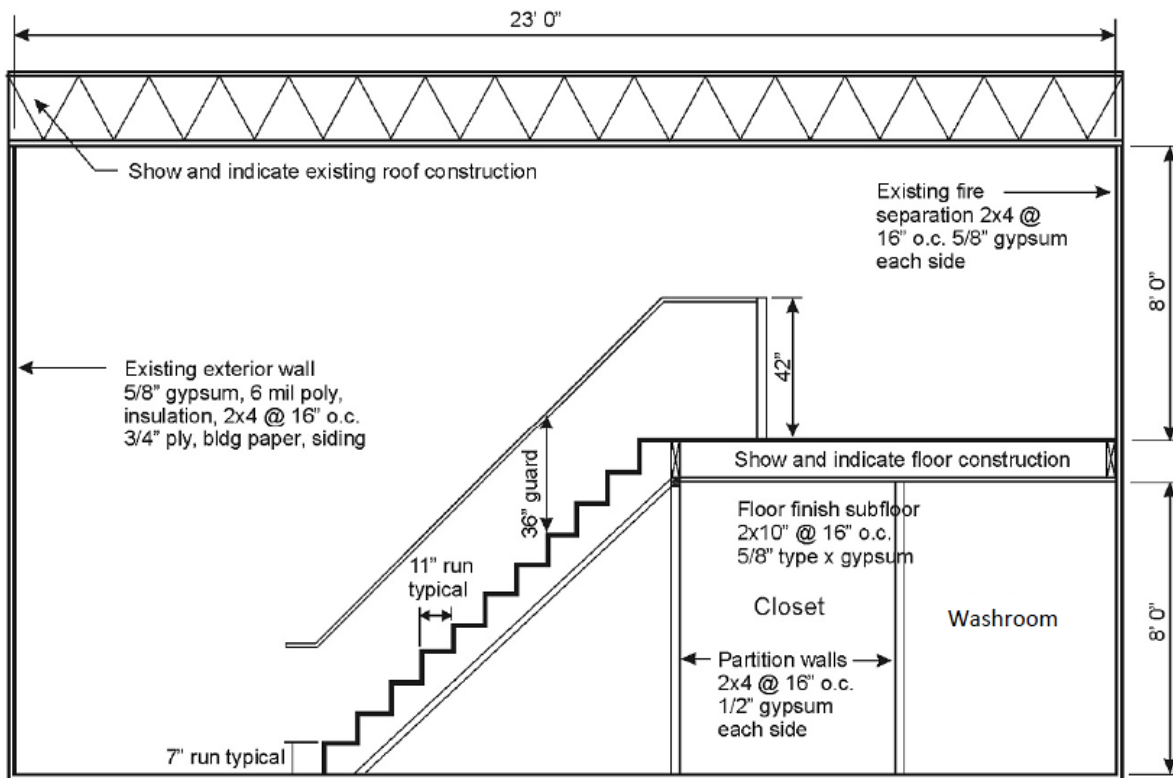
Cross Section A-A (to be 1/4" = 1'-0")
